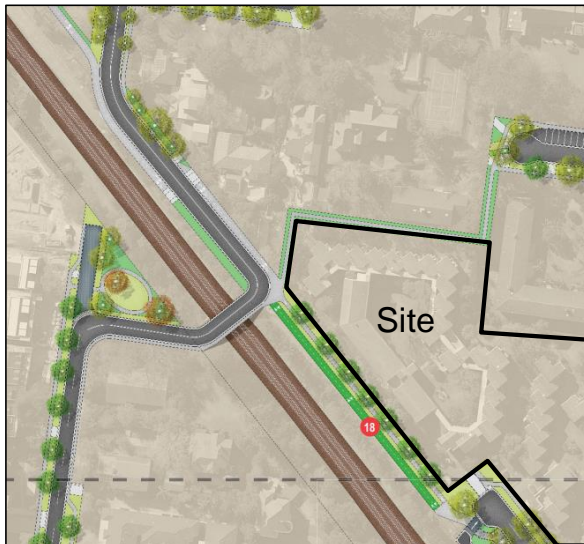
Turramurra Public Domain Plan (Rohini St cul-de-sac)
